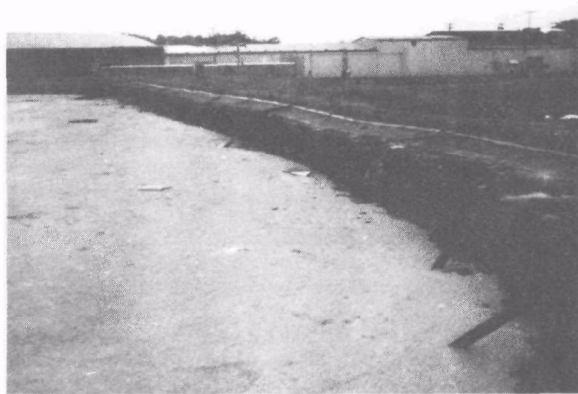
Erosion of interior dike surface at a wastewater stabilization pond in Greenville, Michigan.
